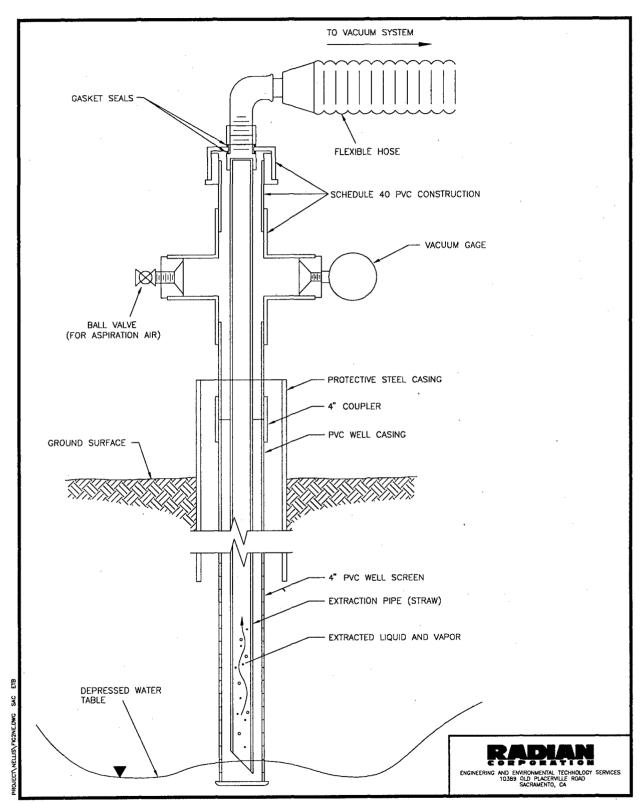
Two-Phase Wellhead Assembly and Extraction Well
